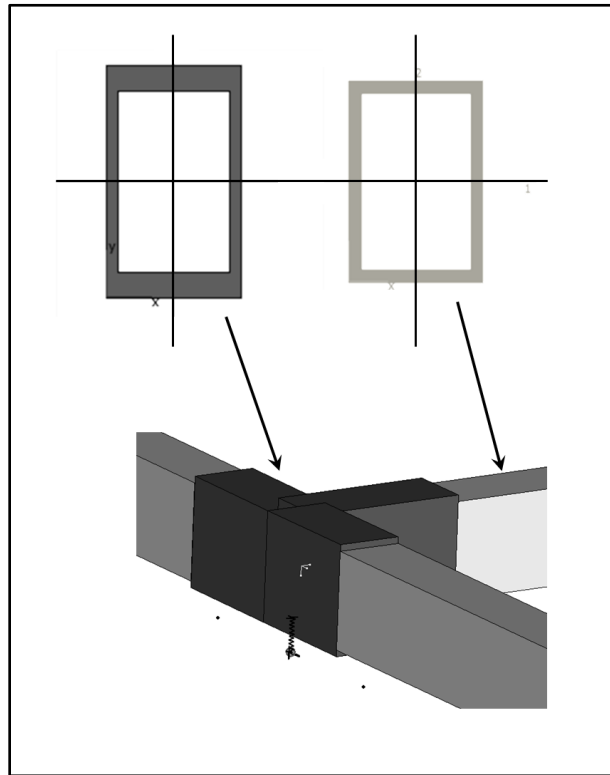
Typical Cross Sections for Elements within Connections (L) and Standard Members (R)
